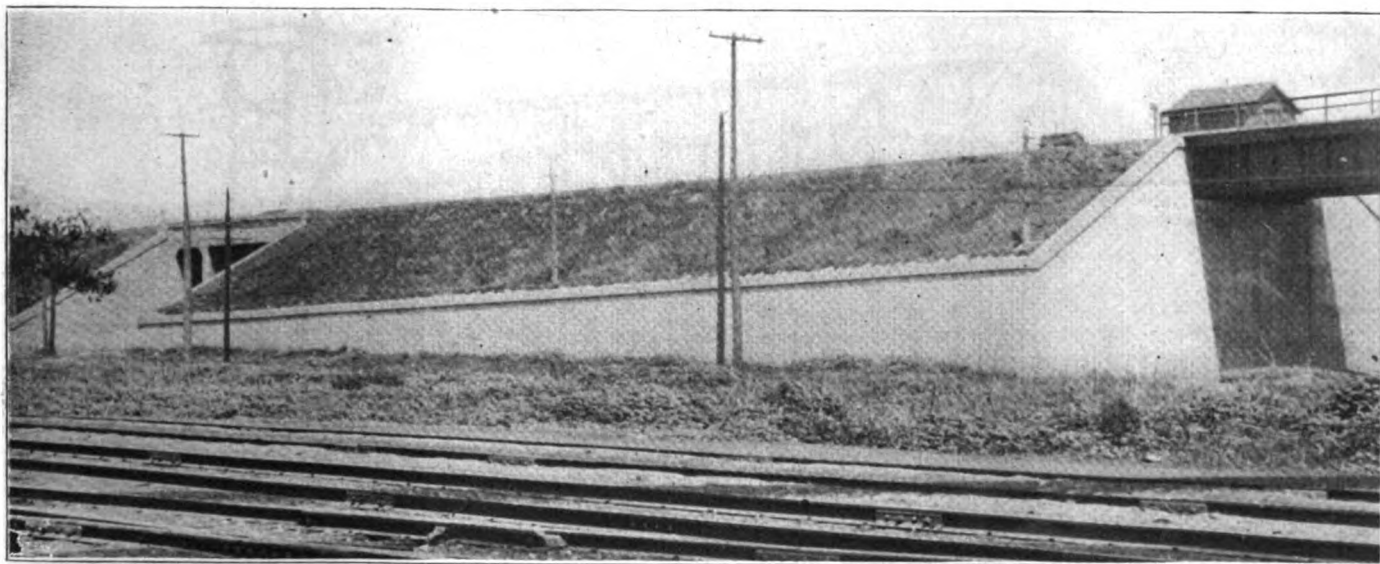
Concrete Arch Pier for Steel Viaduct Construction of the High Line Connection, Kansas City Passenger Terminal.
